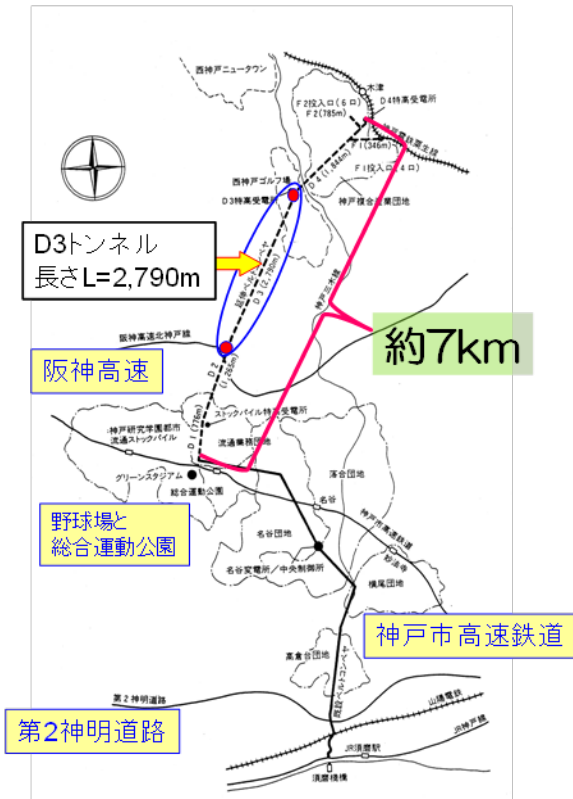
Plan view of belt conveyor tunnel (14 km) and location of D3 tunnel.
